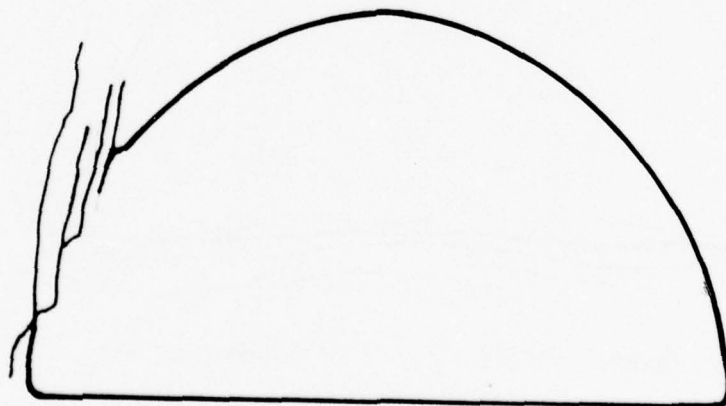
FORMATION OF NEW SURFACE FRACTURES DUE TO CAVITY EXCAVATION
